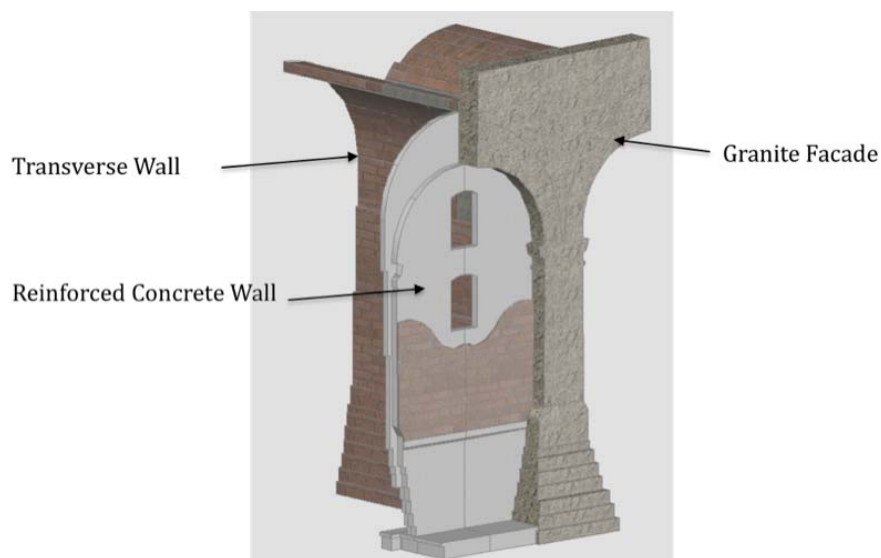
Section of Transverse Brick Wall with Granite Facade and proposed Reinforced Concrete Infill Wall
